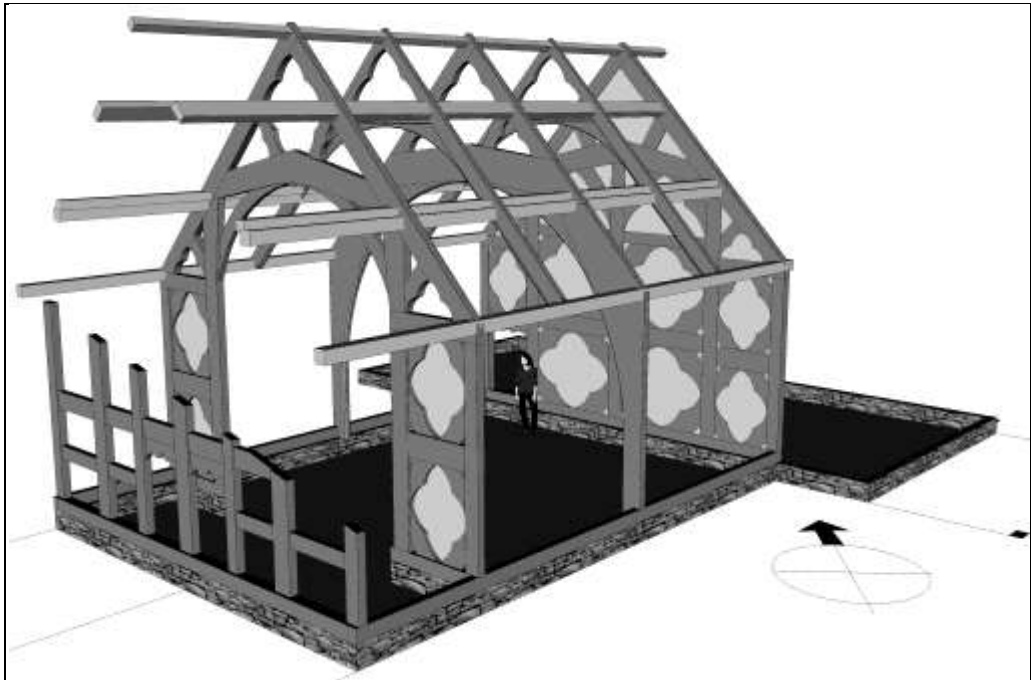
A reconstruction drawing of Wellbrook Manor hall showing the spere truss and the end wall with quatrefoils. The two tiers of cusped windbraces in the roof have been omitted for clarity
